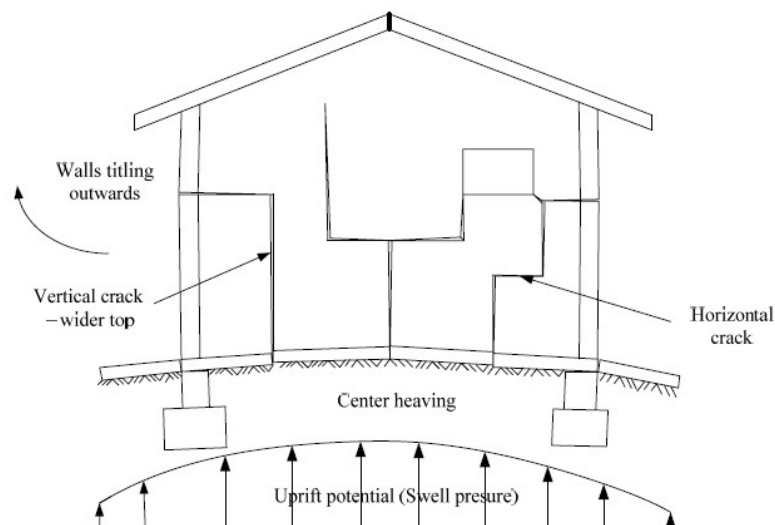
Typical crack pattern on a building due to centre heave[43].
